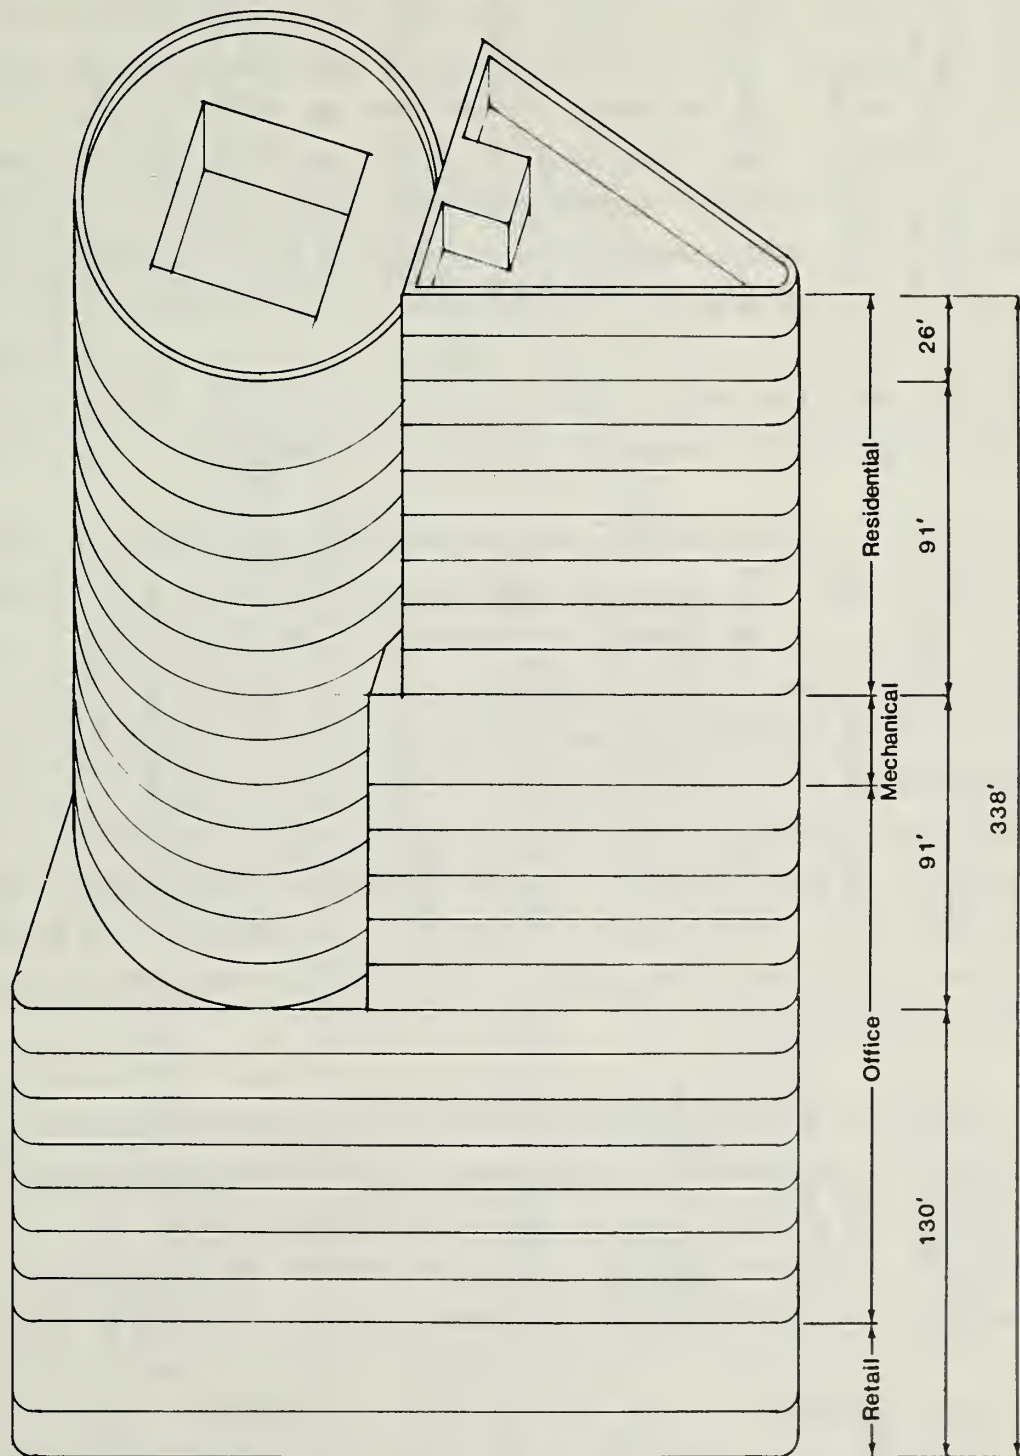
Alternative Three—Guiding Downtown Development Alternative
